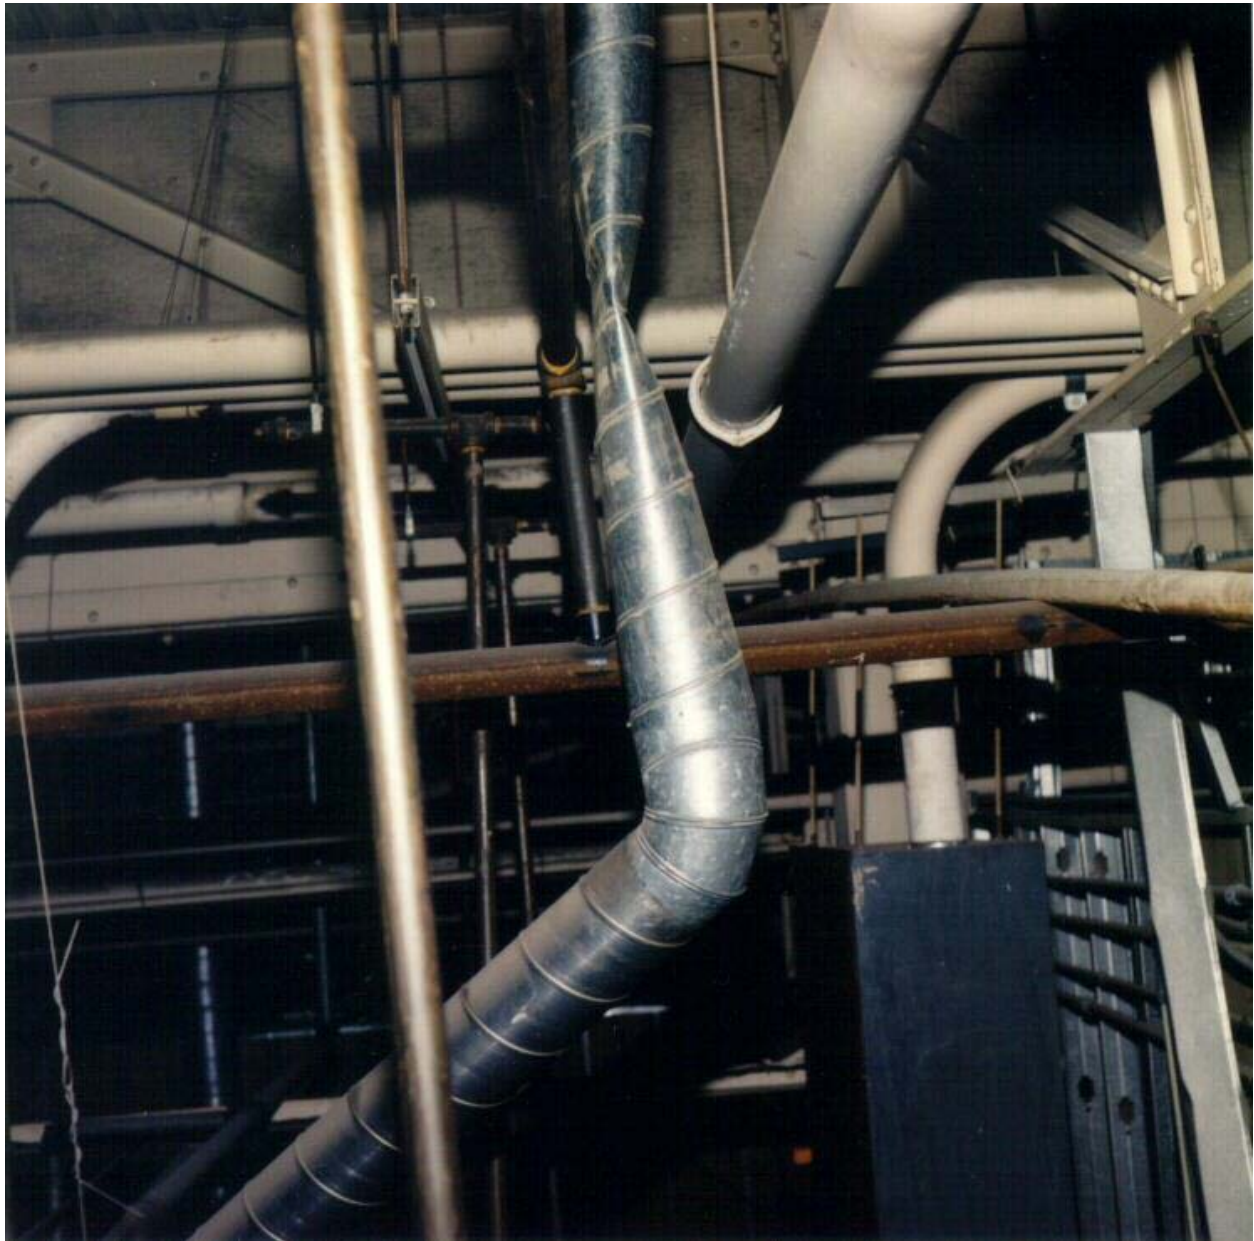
Unbraced duct damaged by impact with piping in 1994 Northridge Earthquake (Photo courtesy of Mason Industries).
